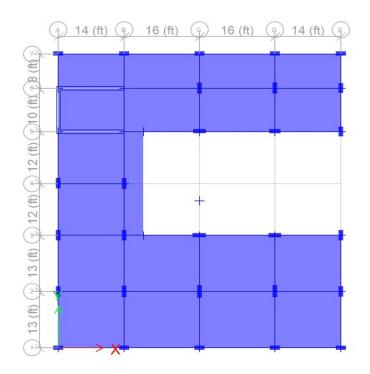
Plan view of (G+12) storied commercial building for Plan 05
